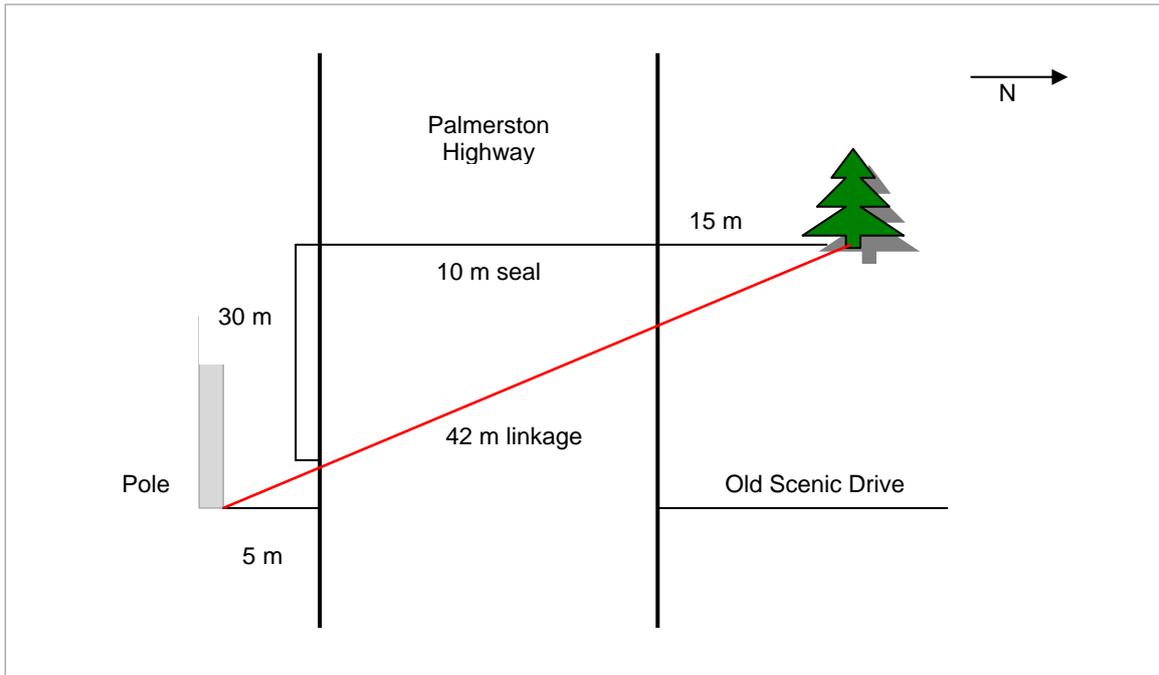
Overpass dimensions and means of attachment – Linkage 4, Millaa Millaa side of Old Scenic Drive.
